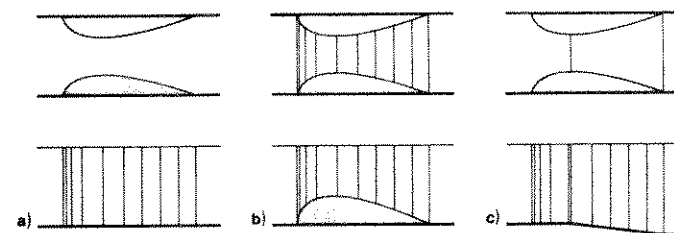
Typical geometries of continuous Venturi flume; plan view (above) and longitudinal section (below); a) horizontal bottom profile, b) weir bottom type and c) sloped bottom type.
